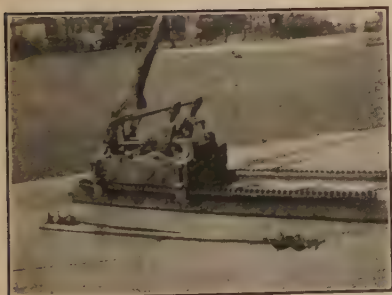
Pipe pushing machine and augers used for crossing under paving.
